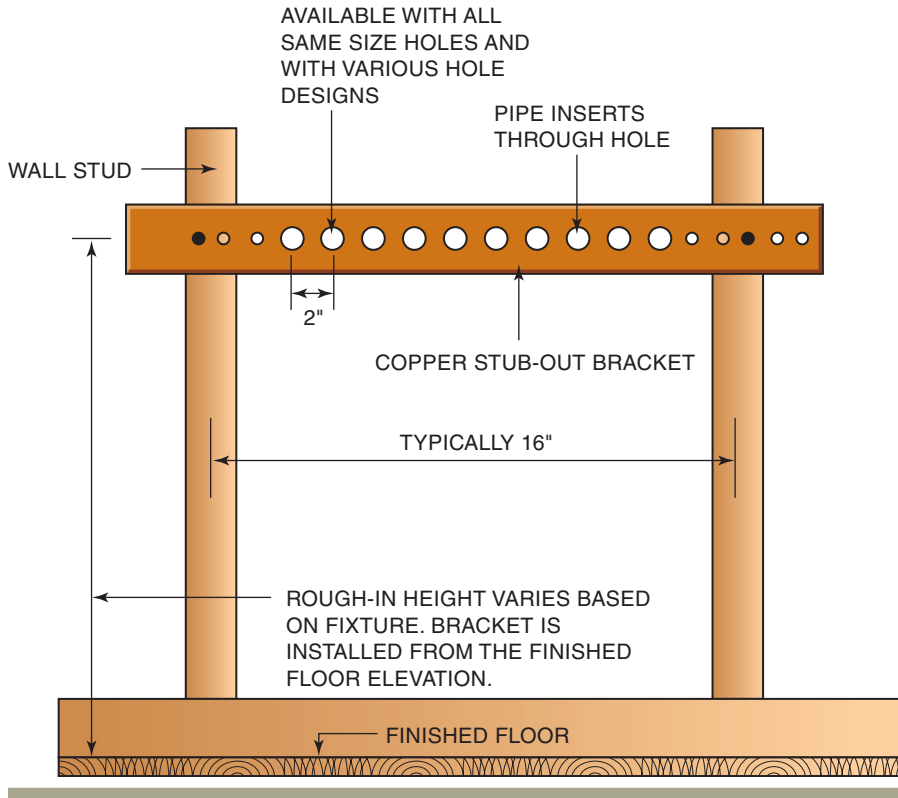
A copper stub-out bracket can secure horizontal piping exiting a wall serving as a fixture.
